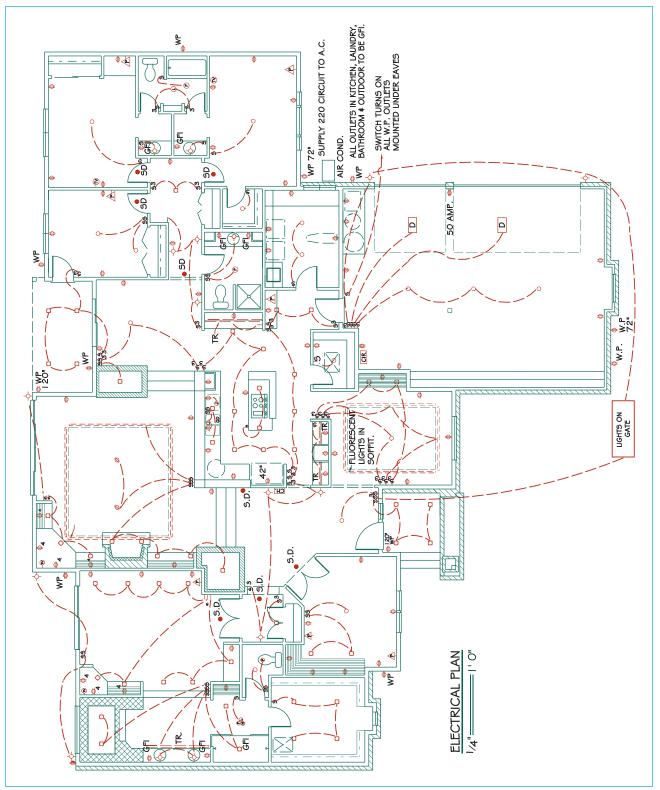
A The electrical plan shows the locations for lights, plugs, switches, and other electrical fixtures and specifications. Using the floor plan as the base drawing, the electrical drawing can be completed by adding the electrical information on new layers.
